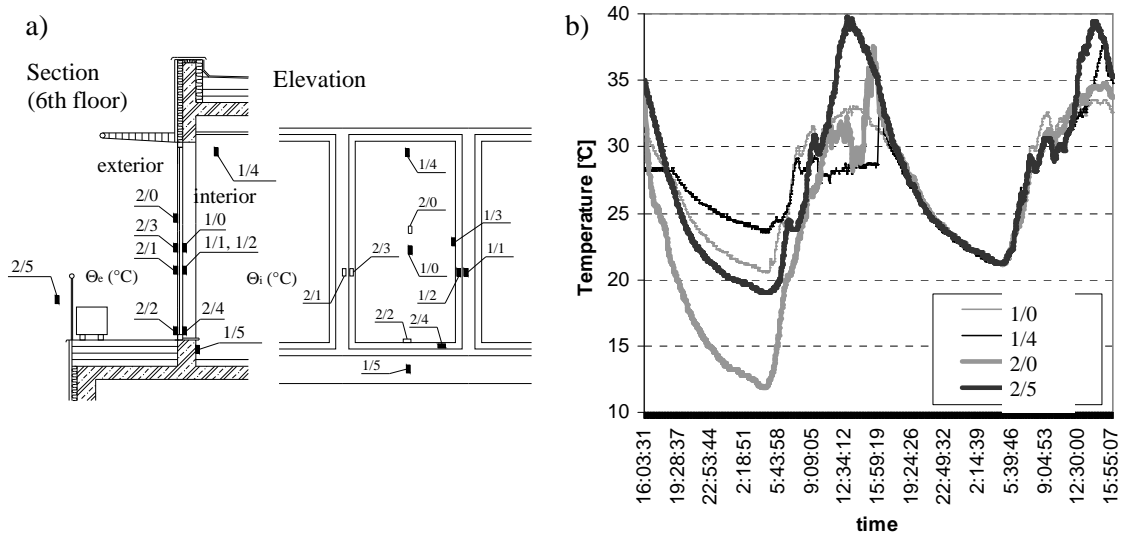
On-site measurements of single glazed façade thermal conditions.
